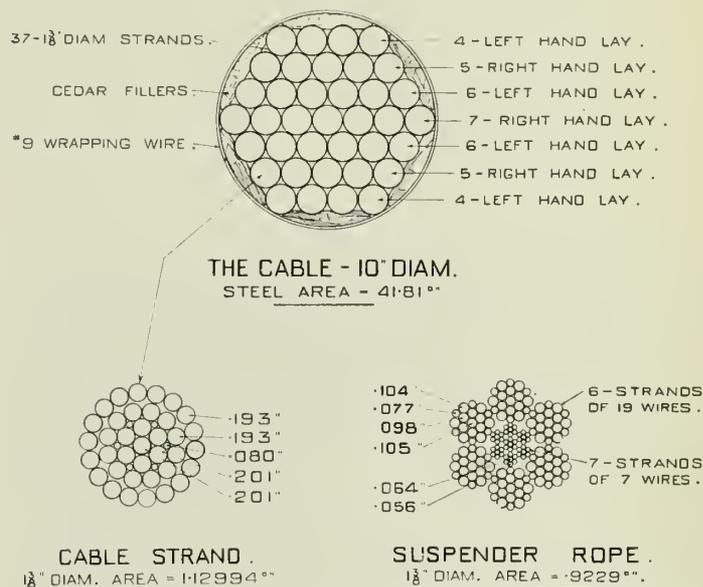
Cross-sections of Cable, Cable Strand and Suspender Rope.
